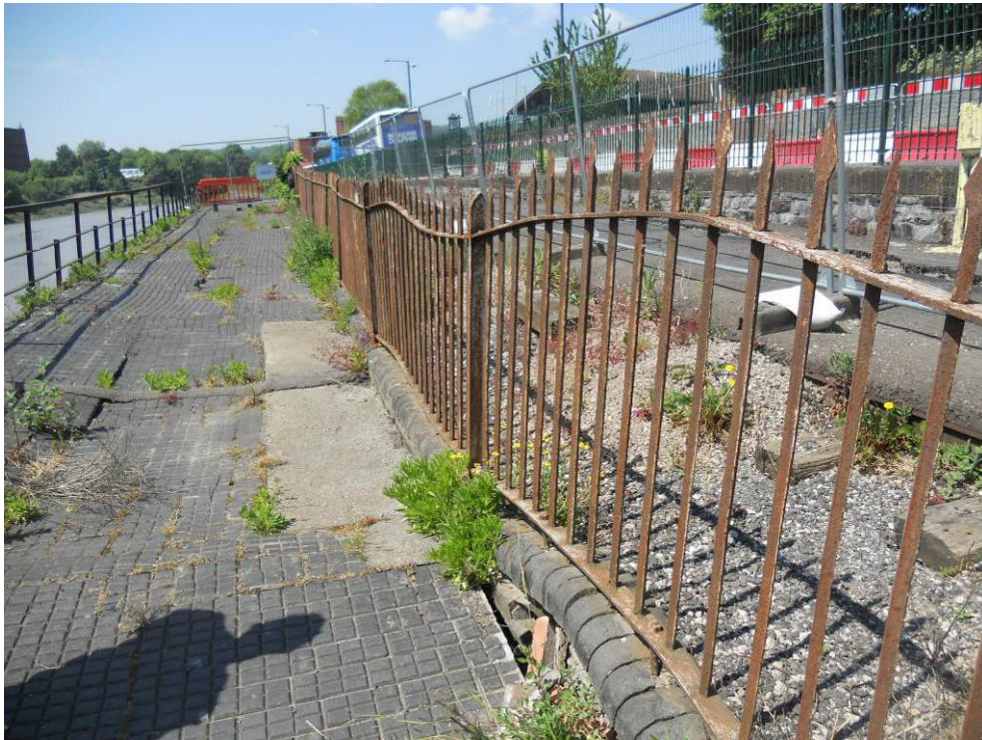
Major Deformation of Railway Railings Due to Ground Movement (Ch165m)
